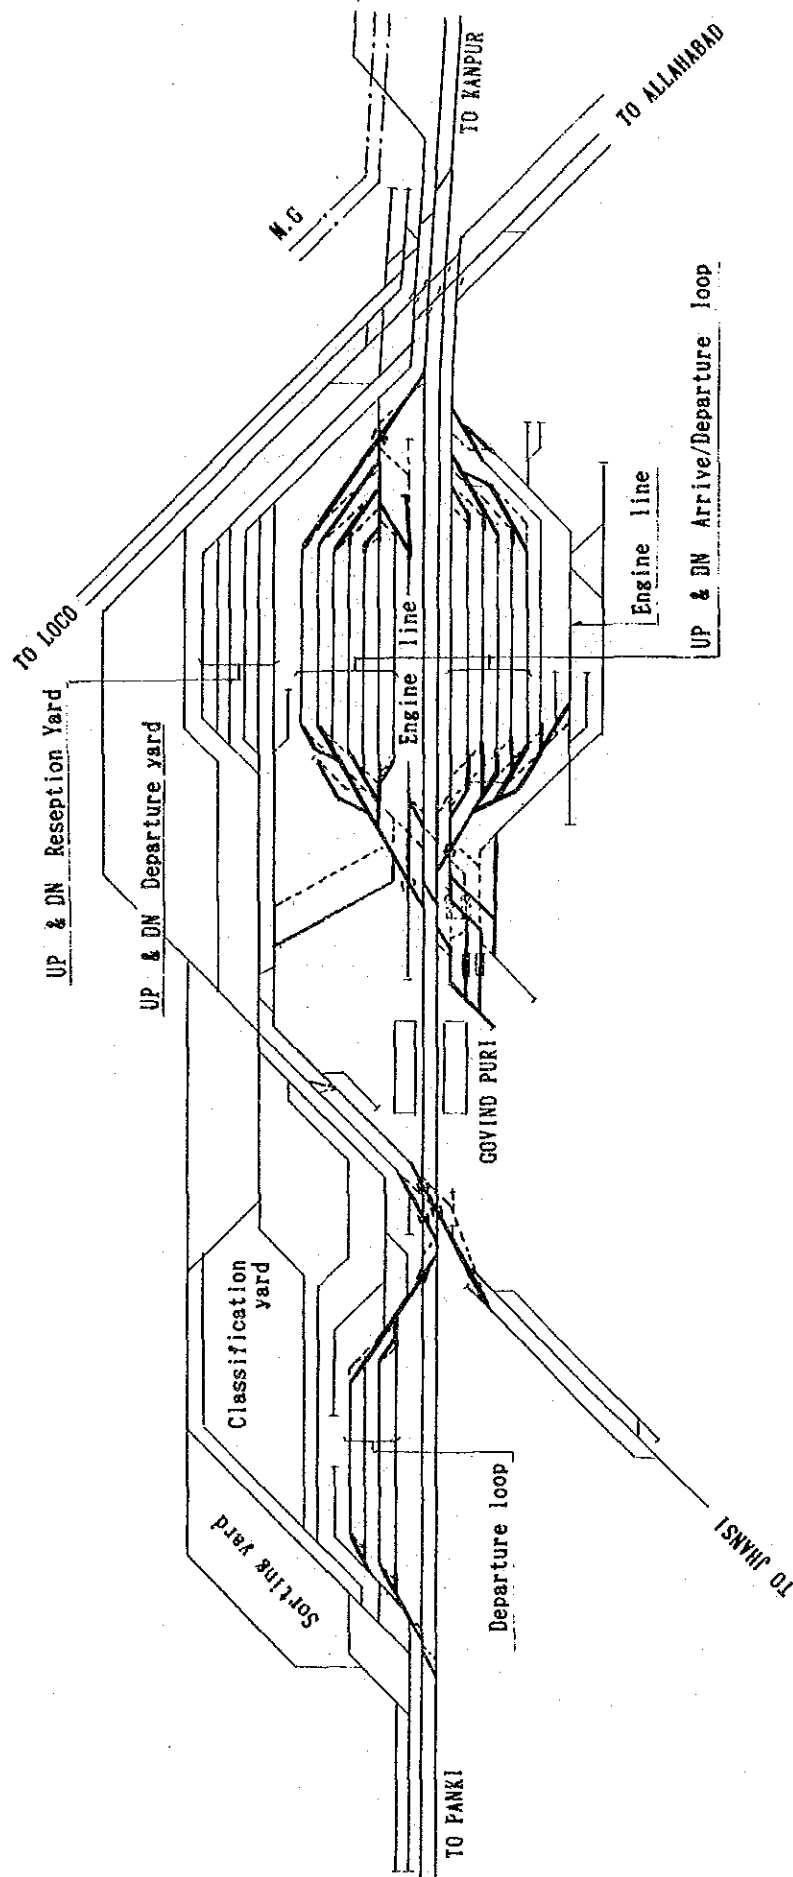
Juhi Marshalling Yard Improvement Plan
